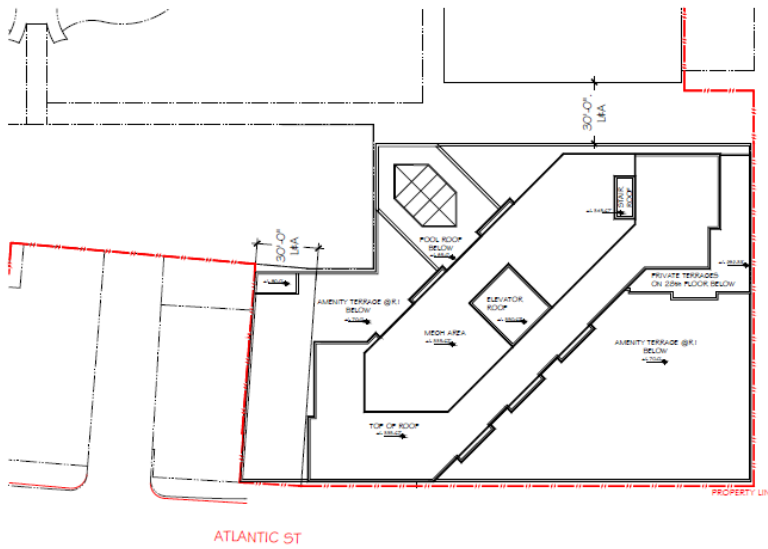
Roof Plan. The angular configuration of the tower allows for distribution of the building mass away from Atlantic Street and Veteran's Park. A shorter tower accommodating the same number of residential units would potentially have a larger and more imposing massing visible from the Street.
